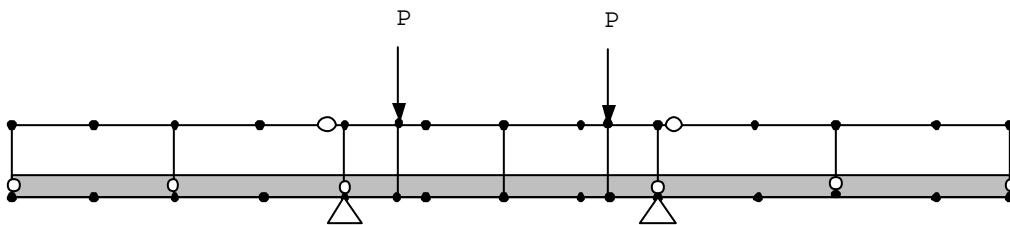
Illustration of 3-Span Bridge Chord, Rods are Hinge Elements, 2-Point Load Beam Model
